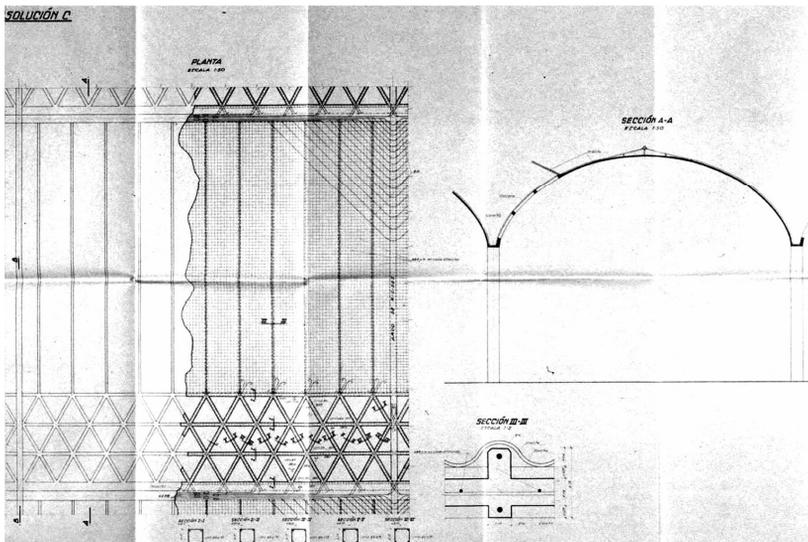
Proposal for an industrial building. The proposed roof was a cylindrical vault whose guideline was a cicloide. The shell had two metre stiffening beams (AET, file number 665).
